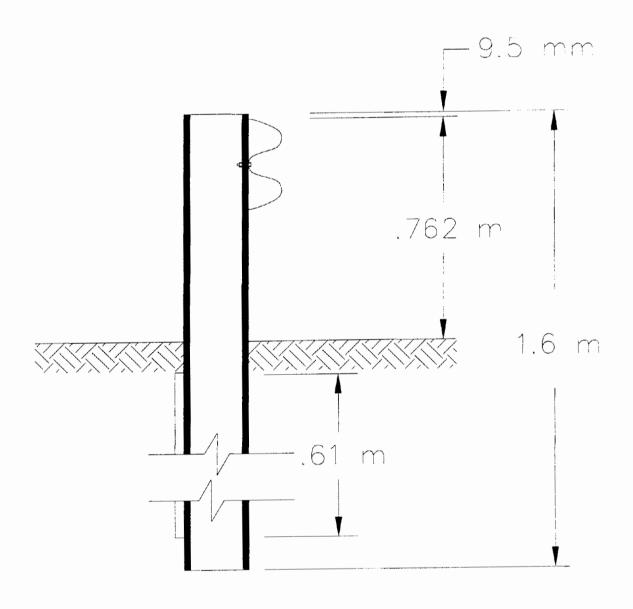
Cross-section of W-beam, weak-post (G2) guardrail system.
